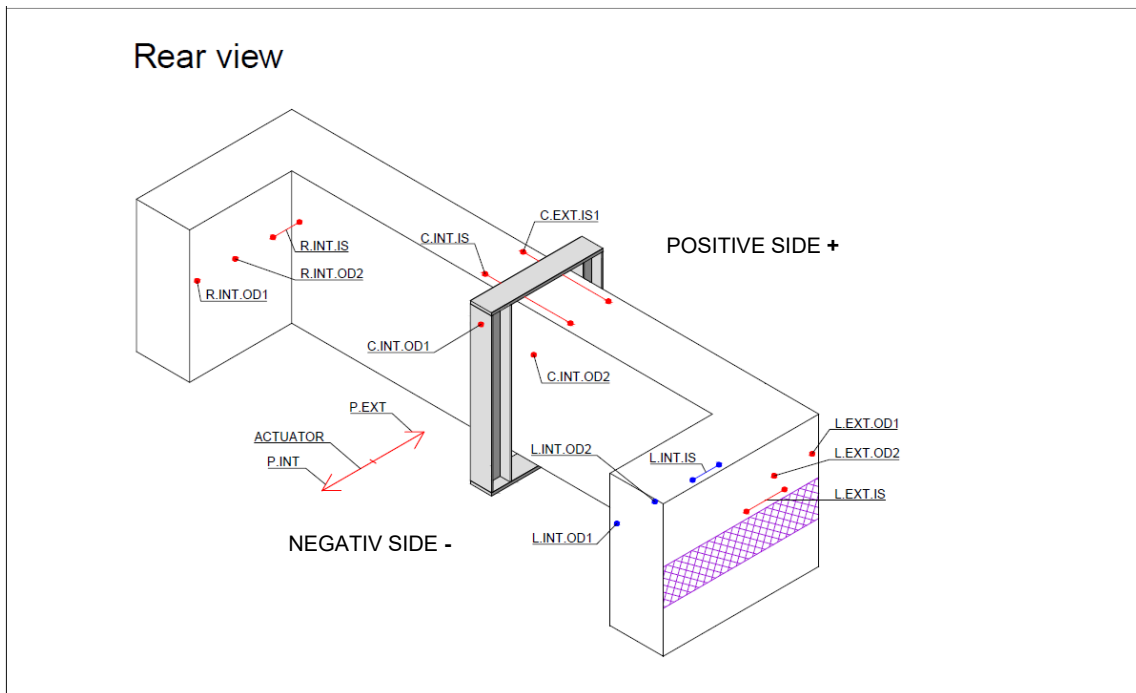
Out of plane bending of "C" walls tests setup, measurement instruments, internal view.
